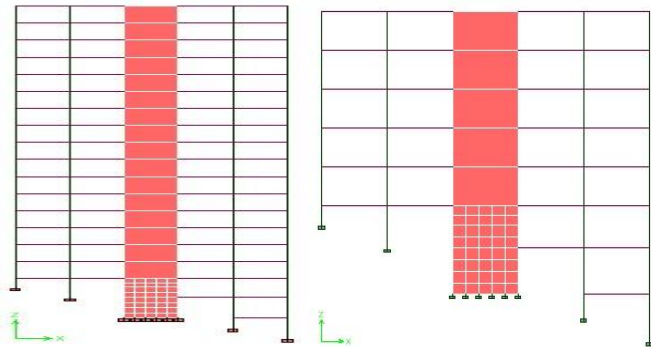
G+15 and G+4 storey buildings, 20° Ground slope
